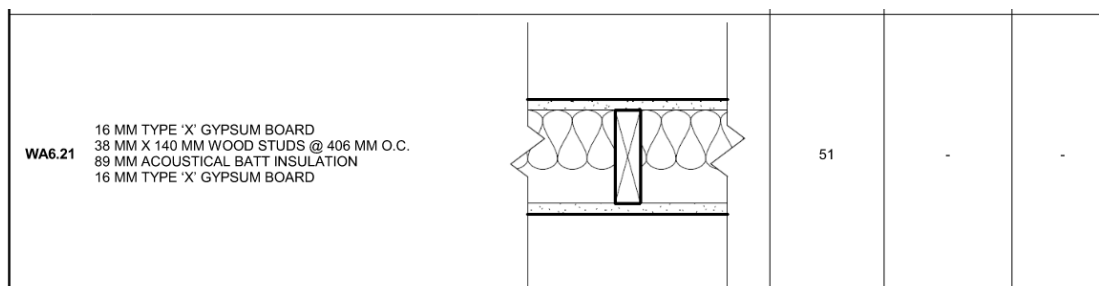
Interior wall type WA6.21 (Training / EOC Room - South Wall)
